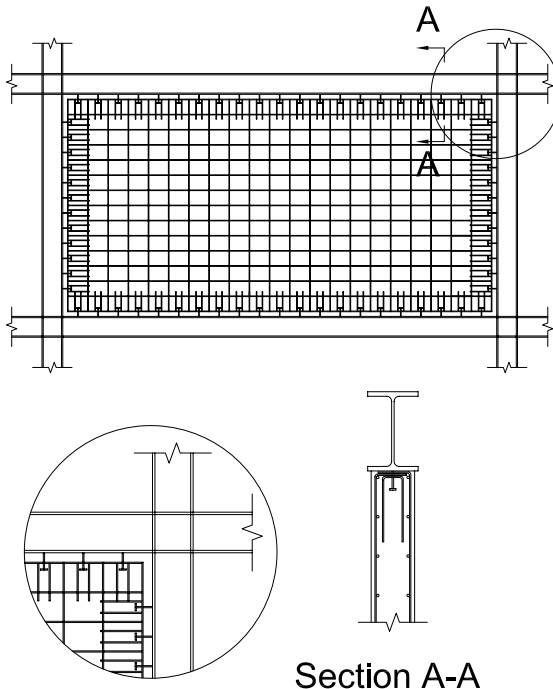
Typical reinforcement detailing in a composite wall for steel headed stud anchors subjected to tension.
